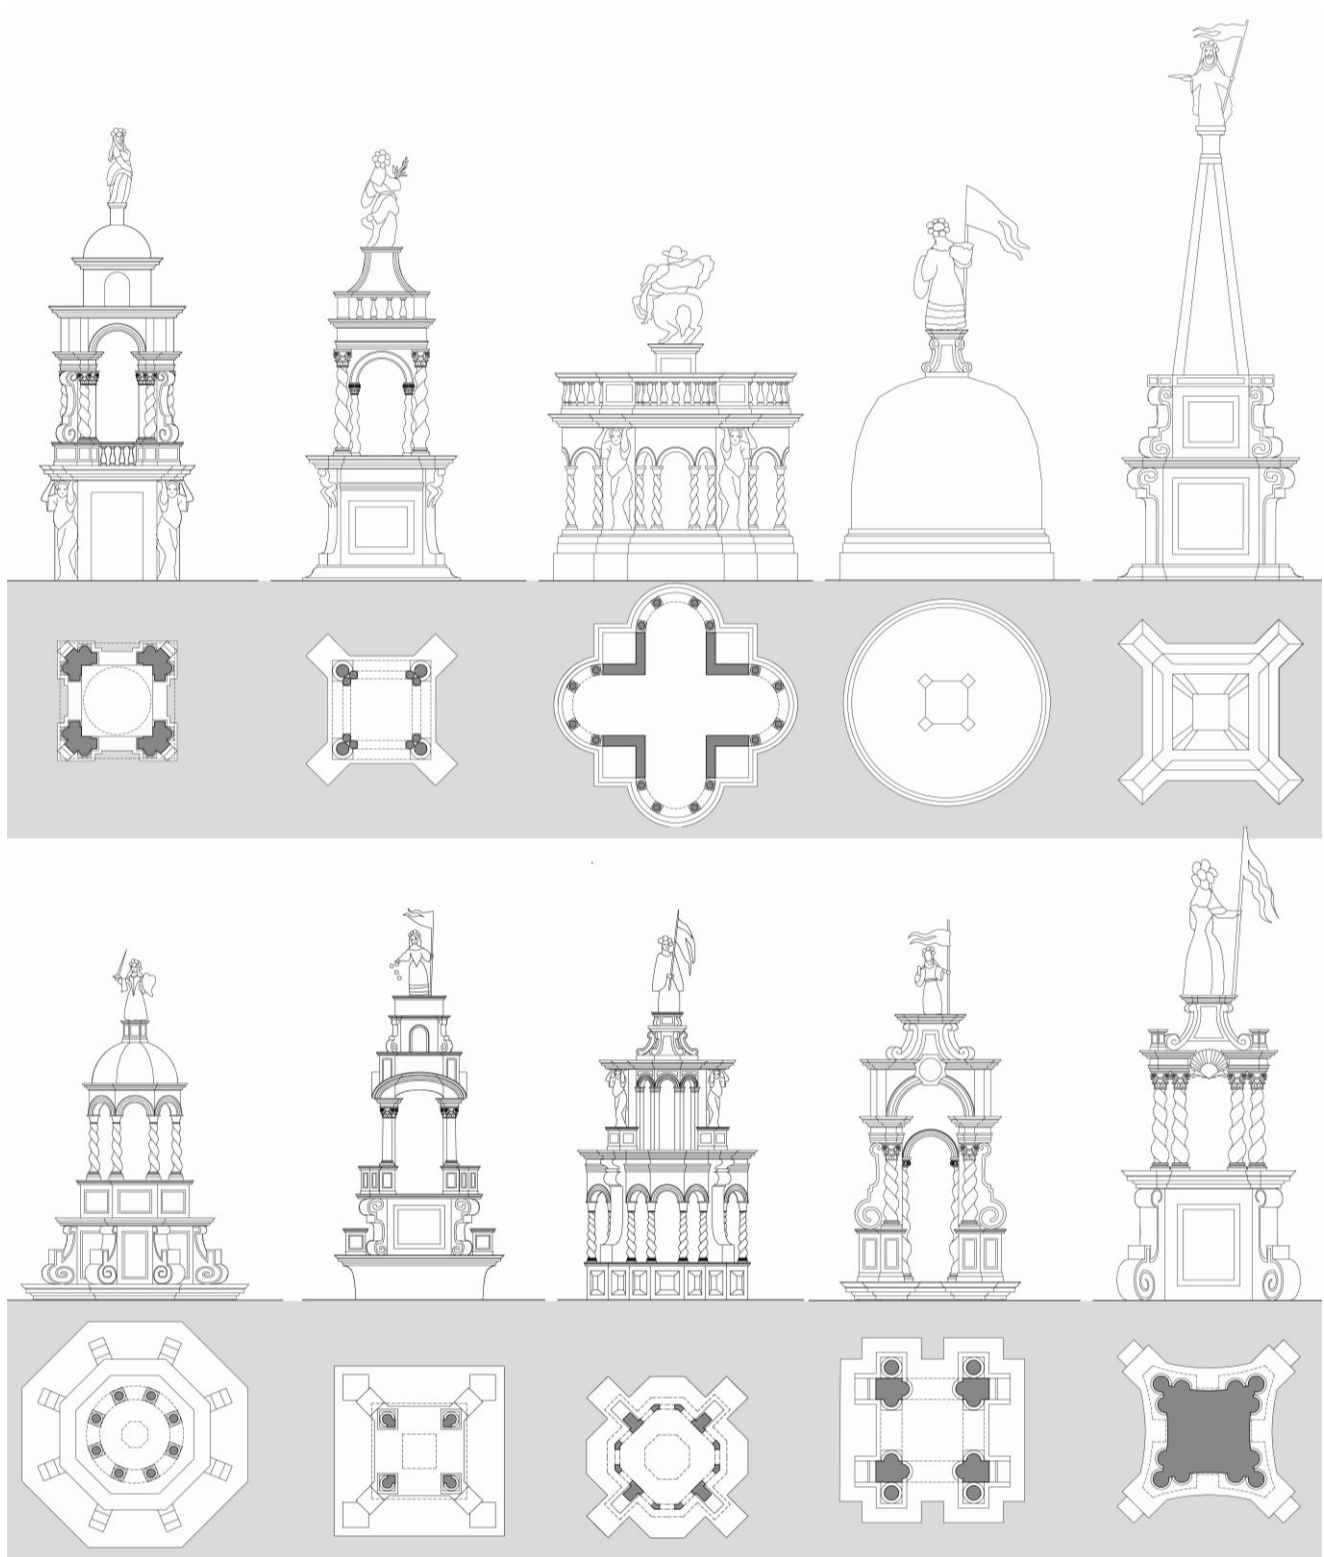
Reconstruction in plan and elevation of the ephemeral machines after *The Procession* painting (Drawing of F. Colonnese)
